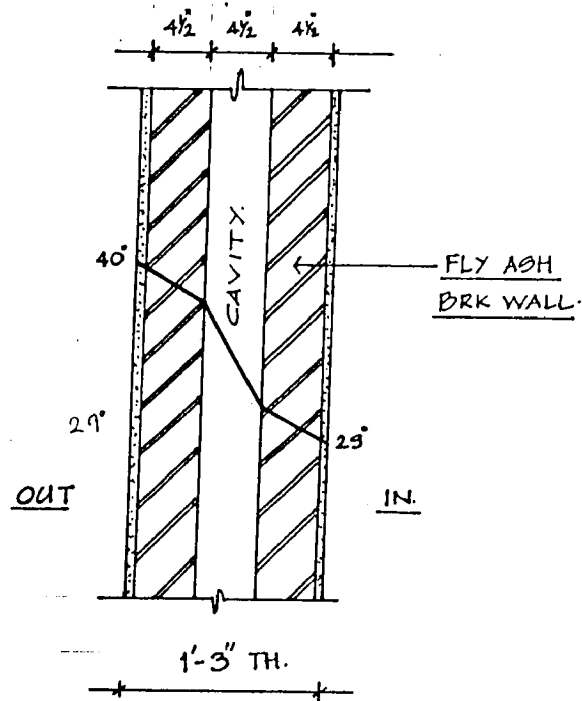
Section of Wall Shows the Temperature Gradient Line in Cavity Wall
